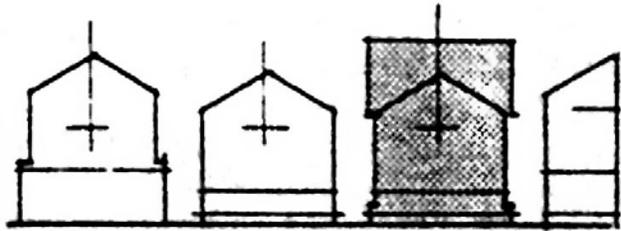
New building emphasizes the height, scale, and roof forms of adjacent buildings.
